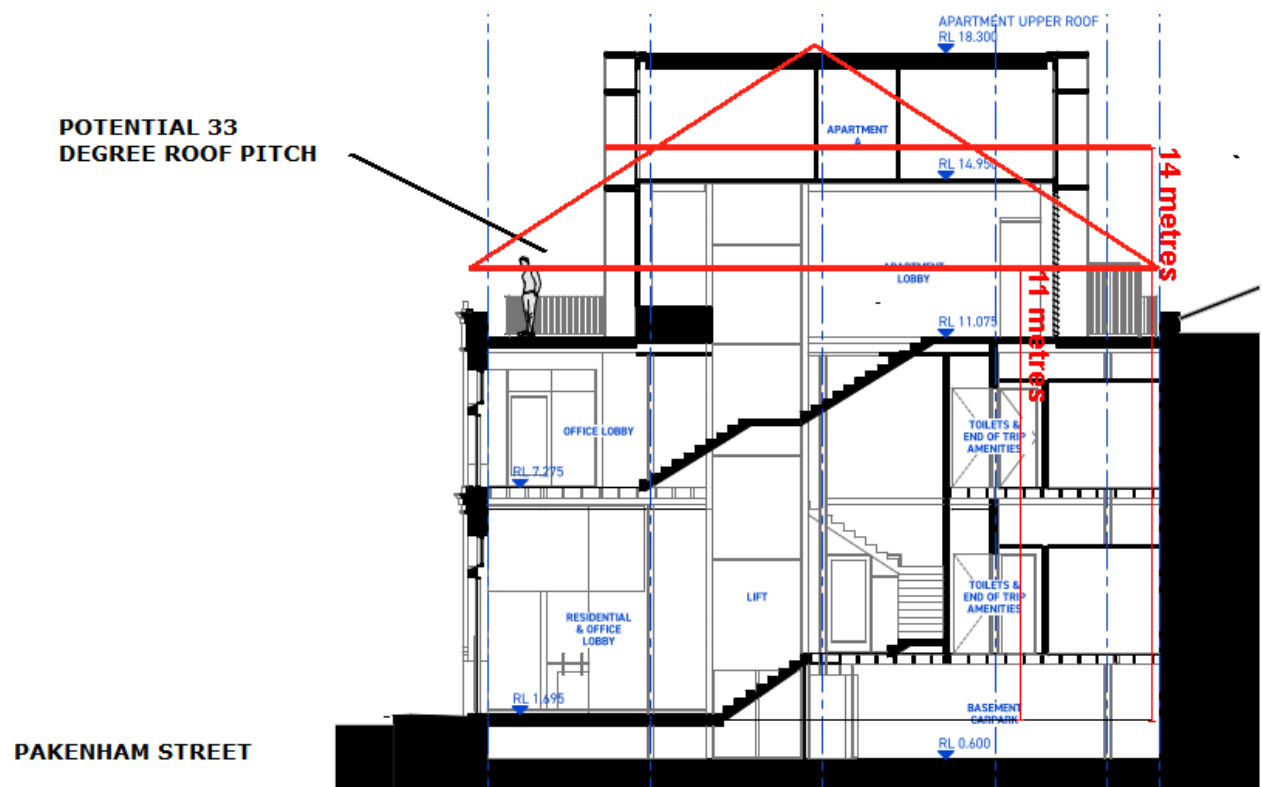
Cross section illustration of the 11m (with 33 degree roof pitch) and 14m (*subject to additional setback of upper storey) permitted building heights.
